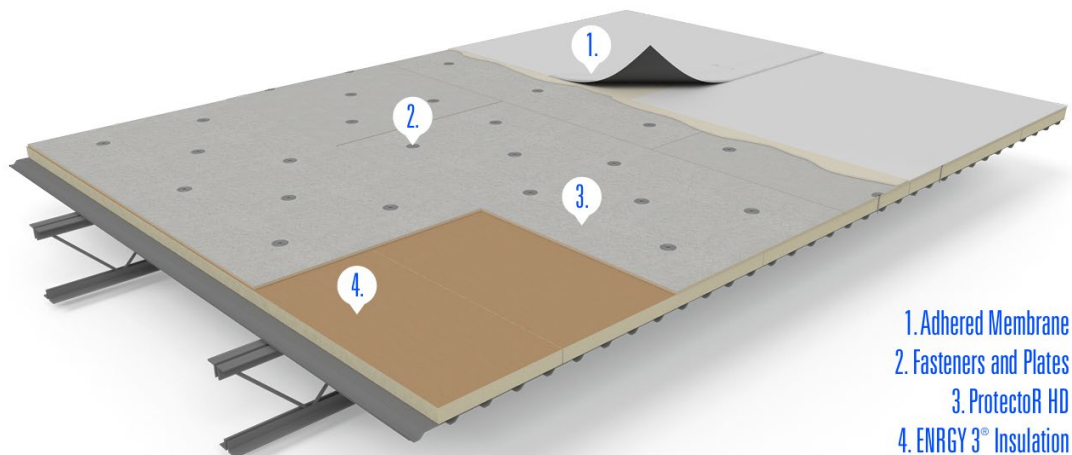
Typical roof assembly with ENRGY 3® roof insulation boards installed direct-to-steel deck.
